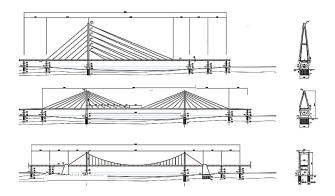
Evaluating bridges. Hongde Bridge (a). Tongxin Bridge (b)
